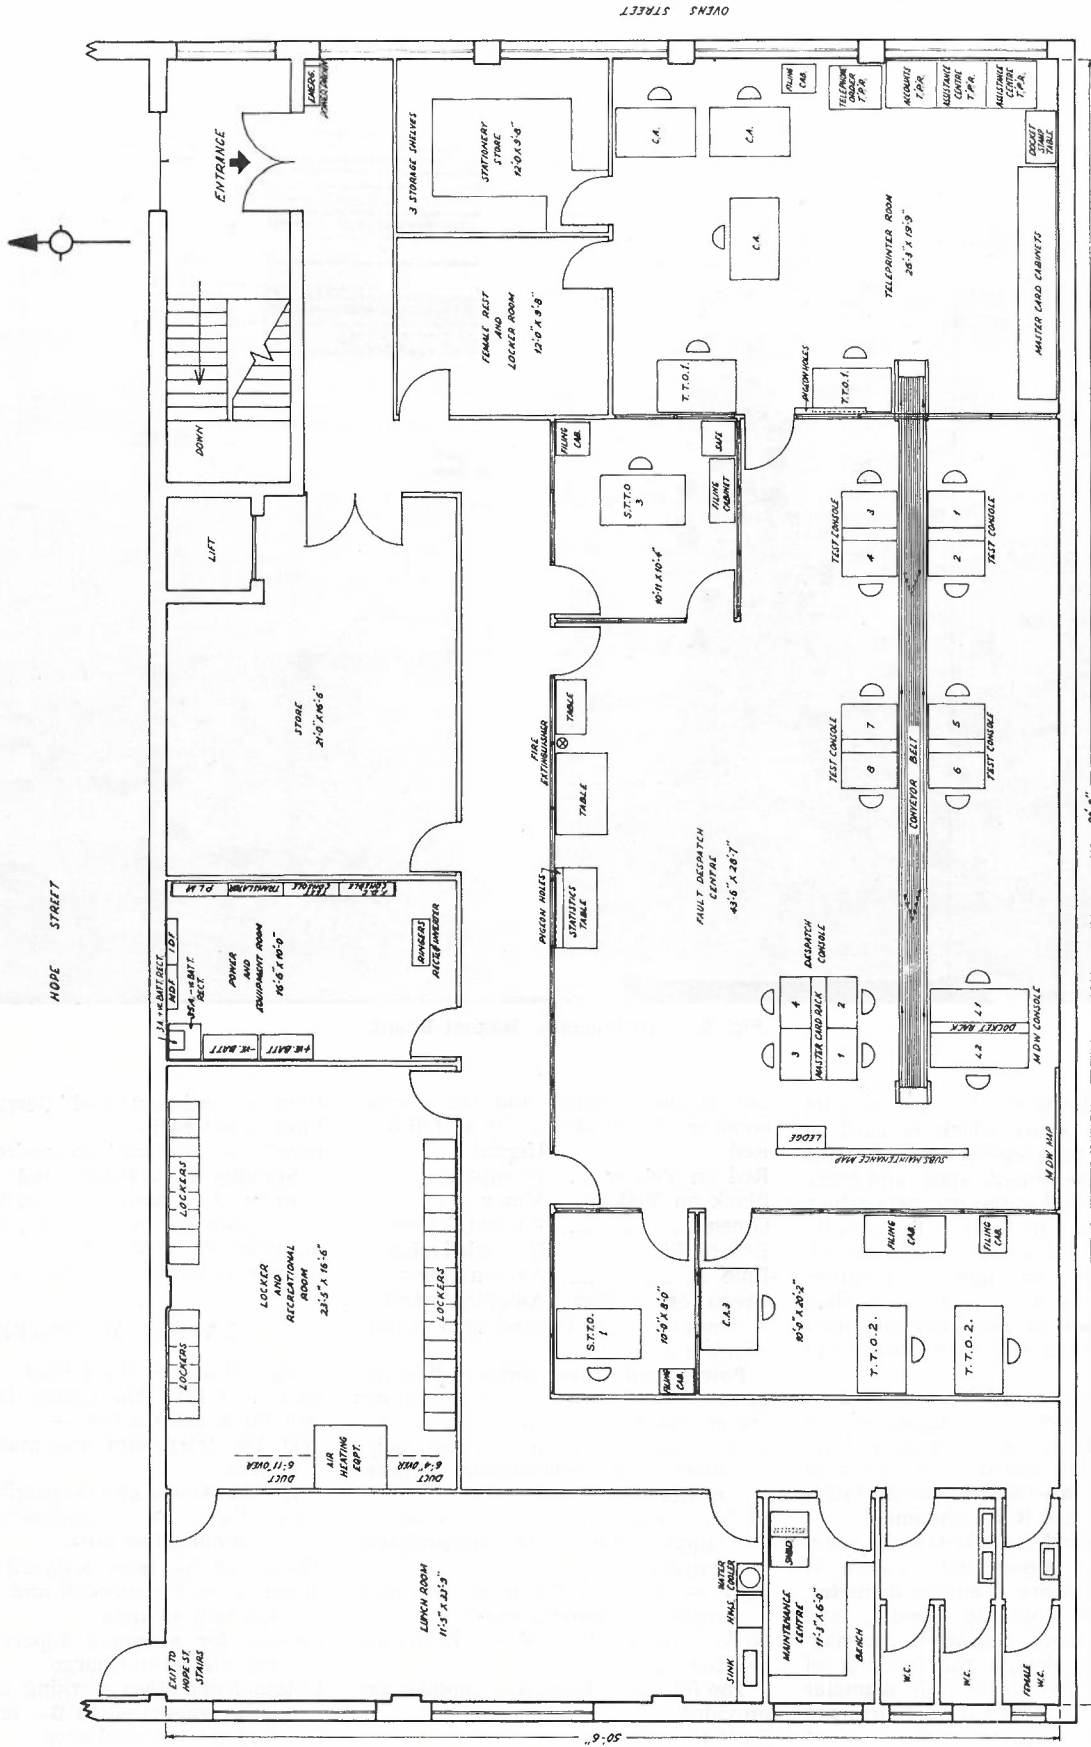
Layout of Brunswick Test and Fault Despatch Centre.
